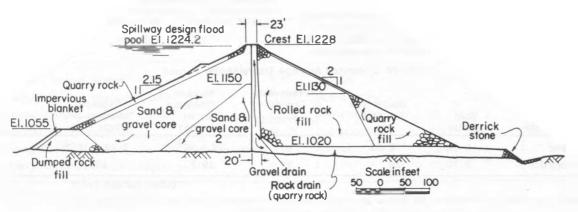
Cross section of Howard A. Hanson Dam, Washington
